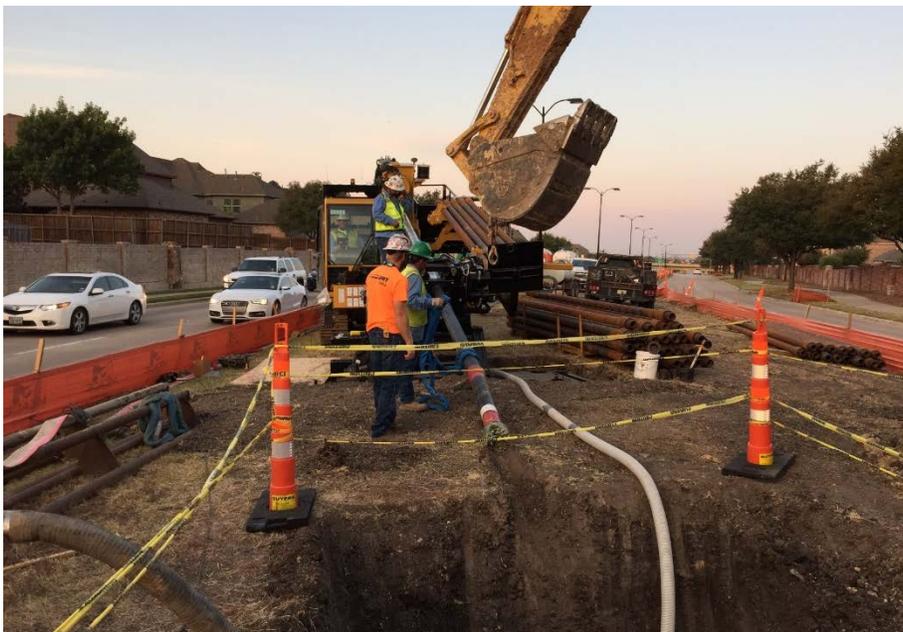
Vermeer 220x300 drill rig being set up to drill the pilot hole.
